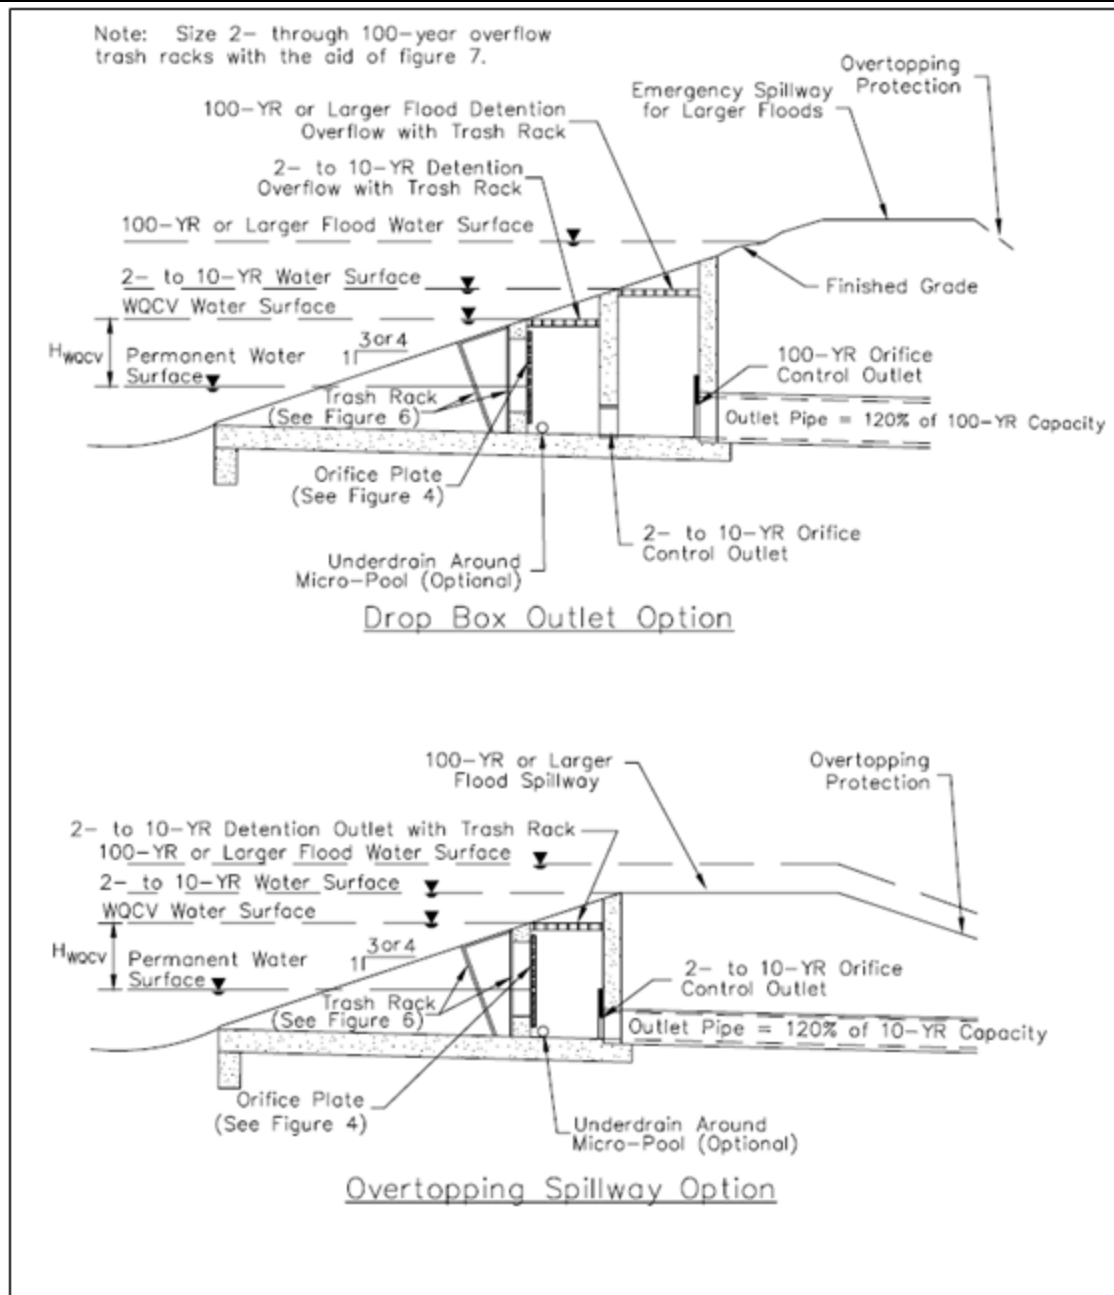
S12-9: Combination outlet design for wet extended detention pond
